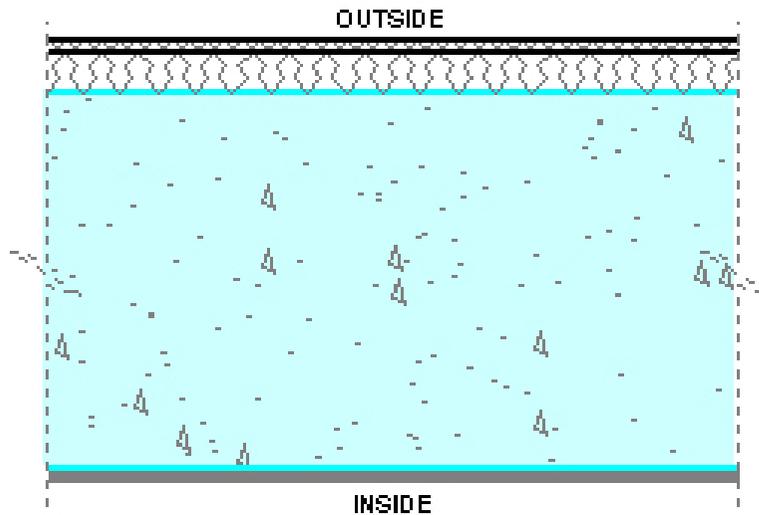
Detail Section - Boukunde II roof - EXISTING
